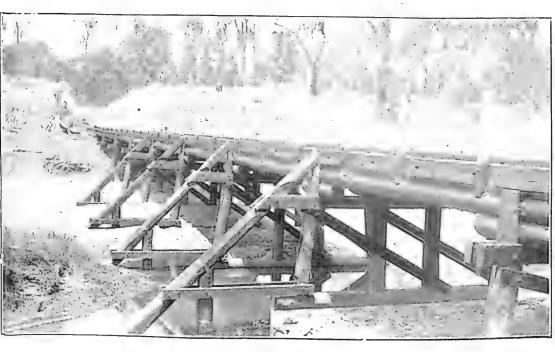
LOW-LEVEL BRIDGE, STUART RIVER, WONDAI-PROSTON ROAD.
